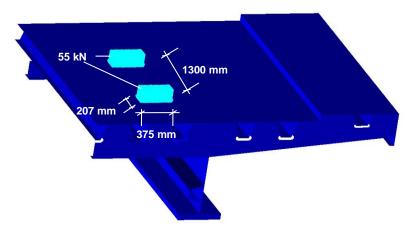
wheel loads and wheel areas on FE- model of the bridge.
